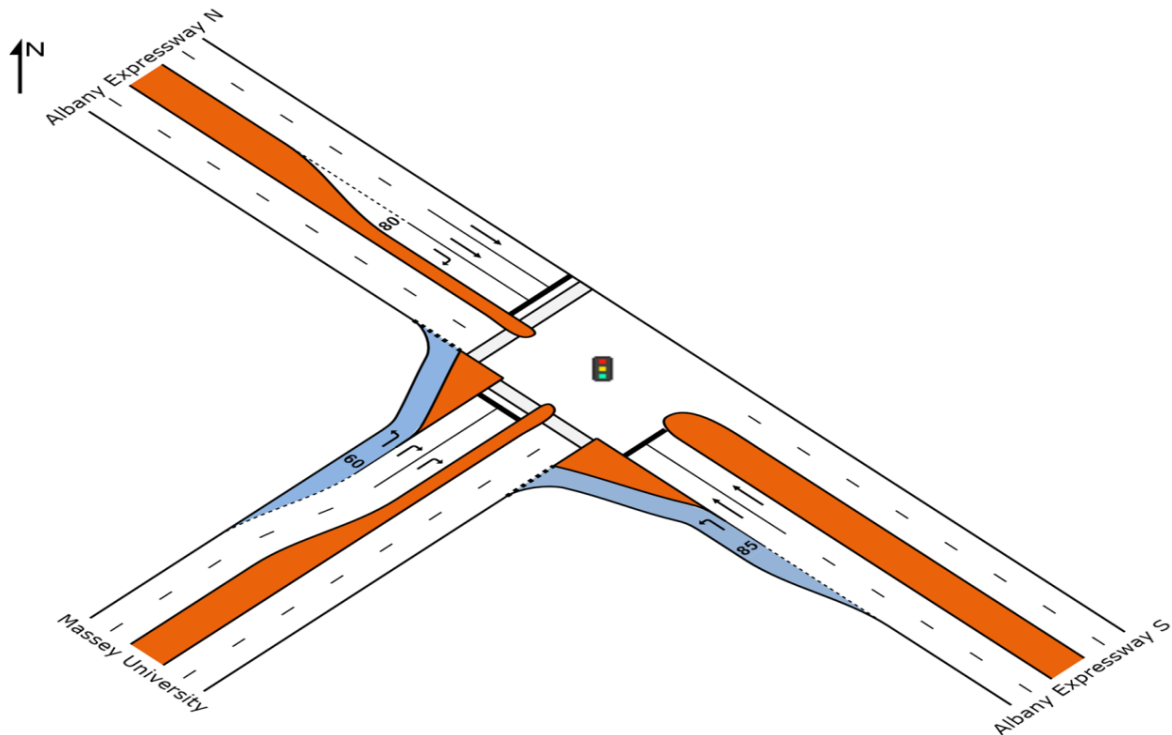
Base model-existing layout of Albany Expressway-Massey University Avenue intersection
